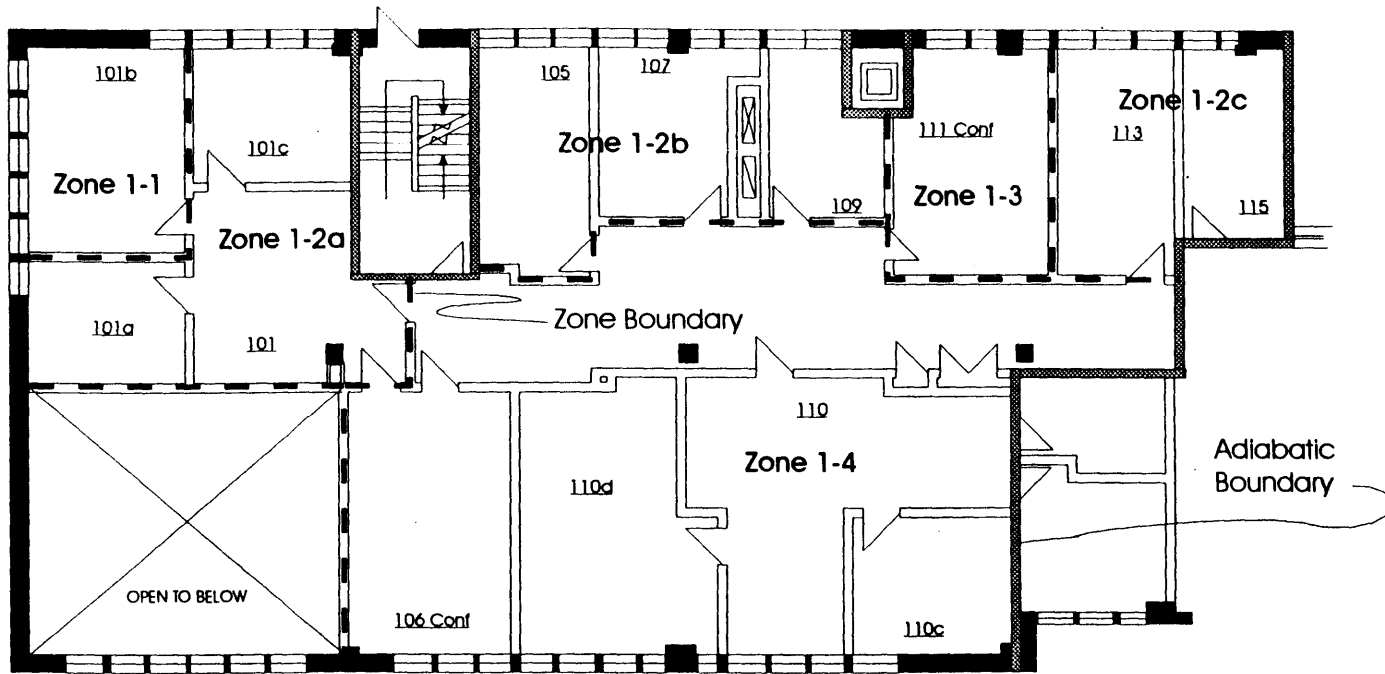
Building E51 - First Floor Level Zoning Option 1D
